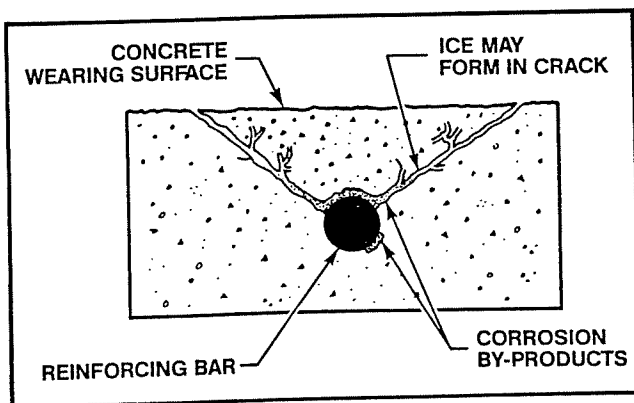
As steel reinforcement rusts, it expands, causing destruction to surrounding concrete.
